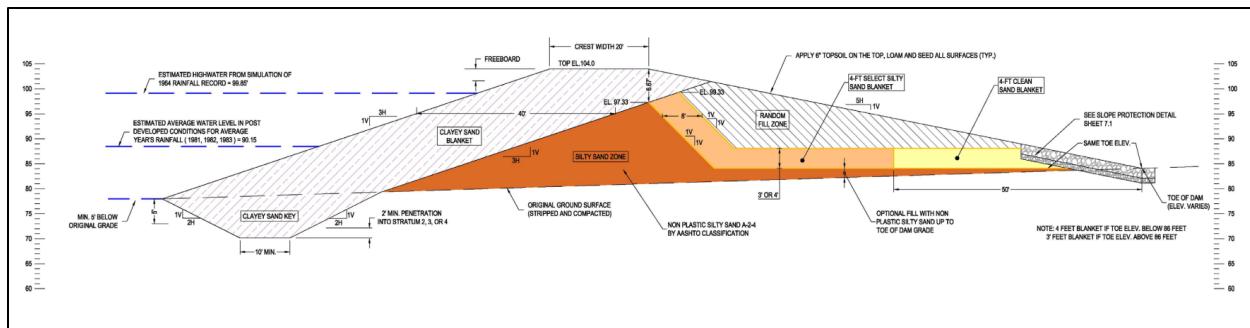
Cross Section of the Dove Pond Dam (Dove Pond Dam Emergency Action Plan 2021)
